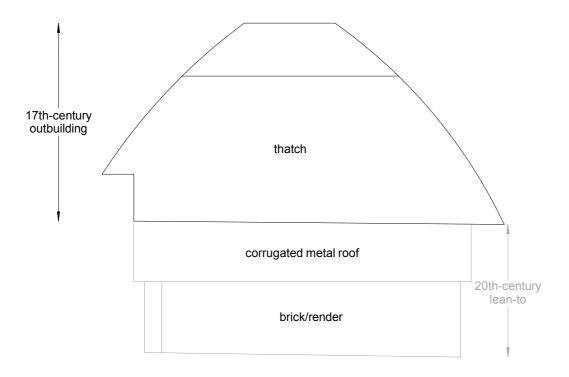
South elevation of structure 5 (17th-century outbuilding), with alterations shown grey.
